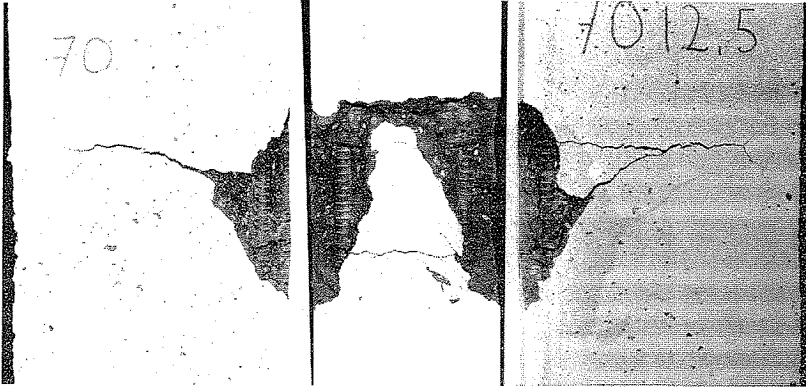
Failure of S.B.-specimen No. 70/12.5.
